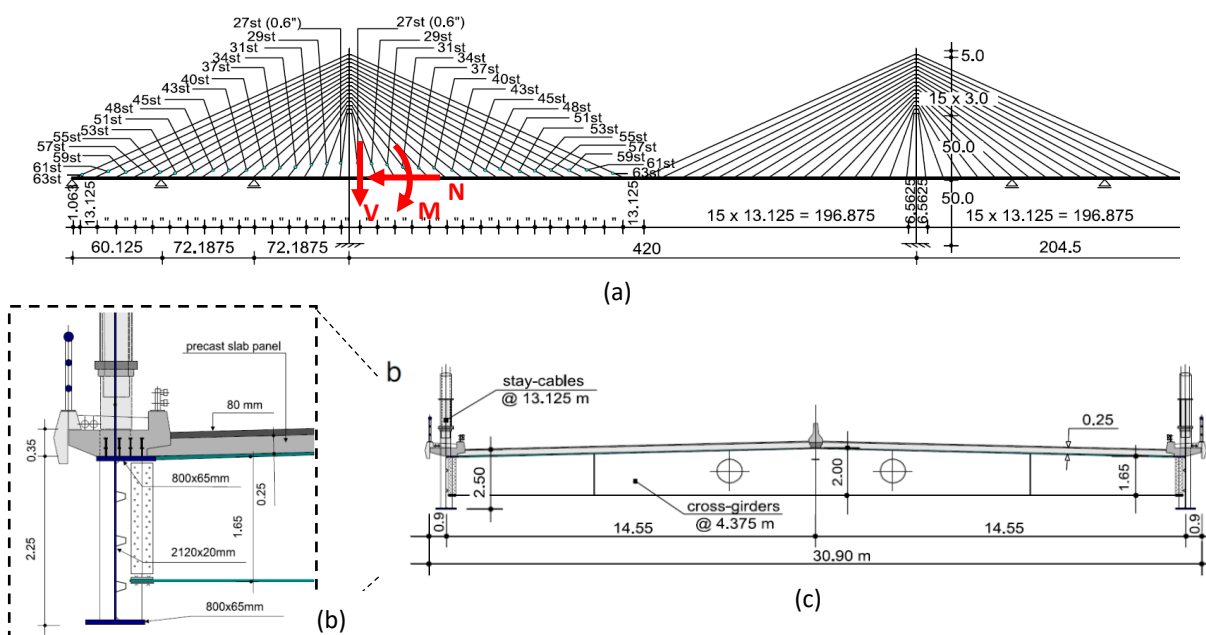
Steel-concrete composite cable-stayed bridge deck example: (a) N-M-V interaction at governing section, (b) I-girder cross-section and (c) deck cross-section [2, 3]
